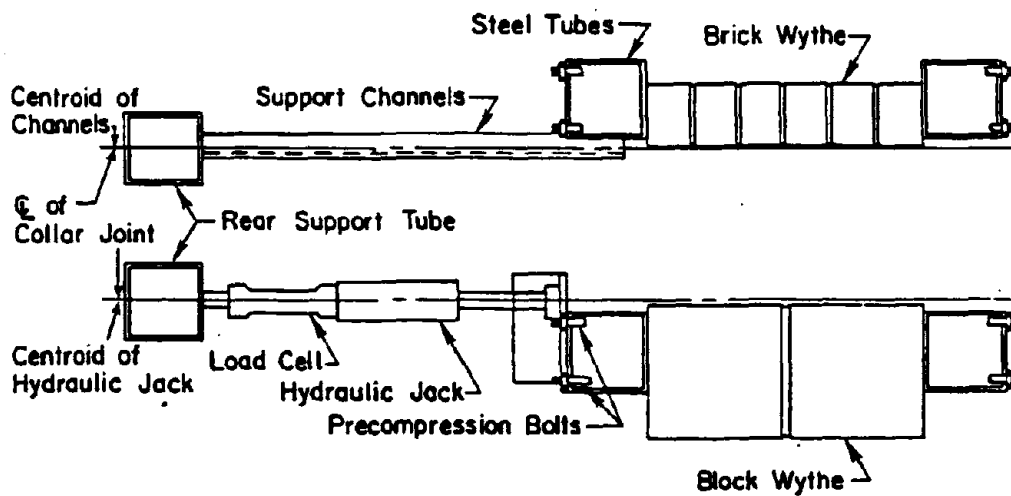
Schematic Drawing of a Specimen in the Test Apparatus
